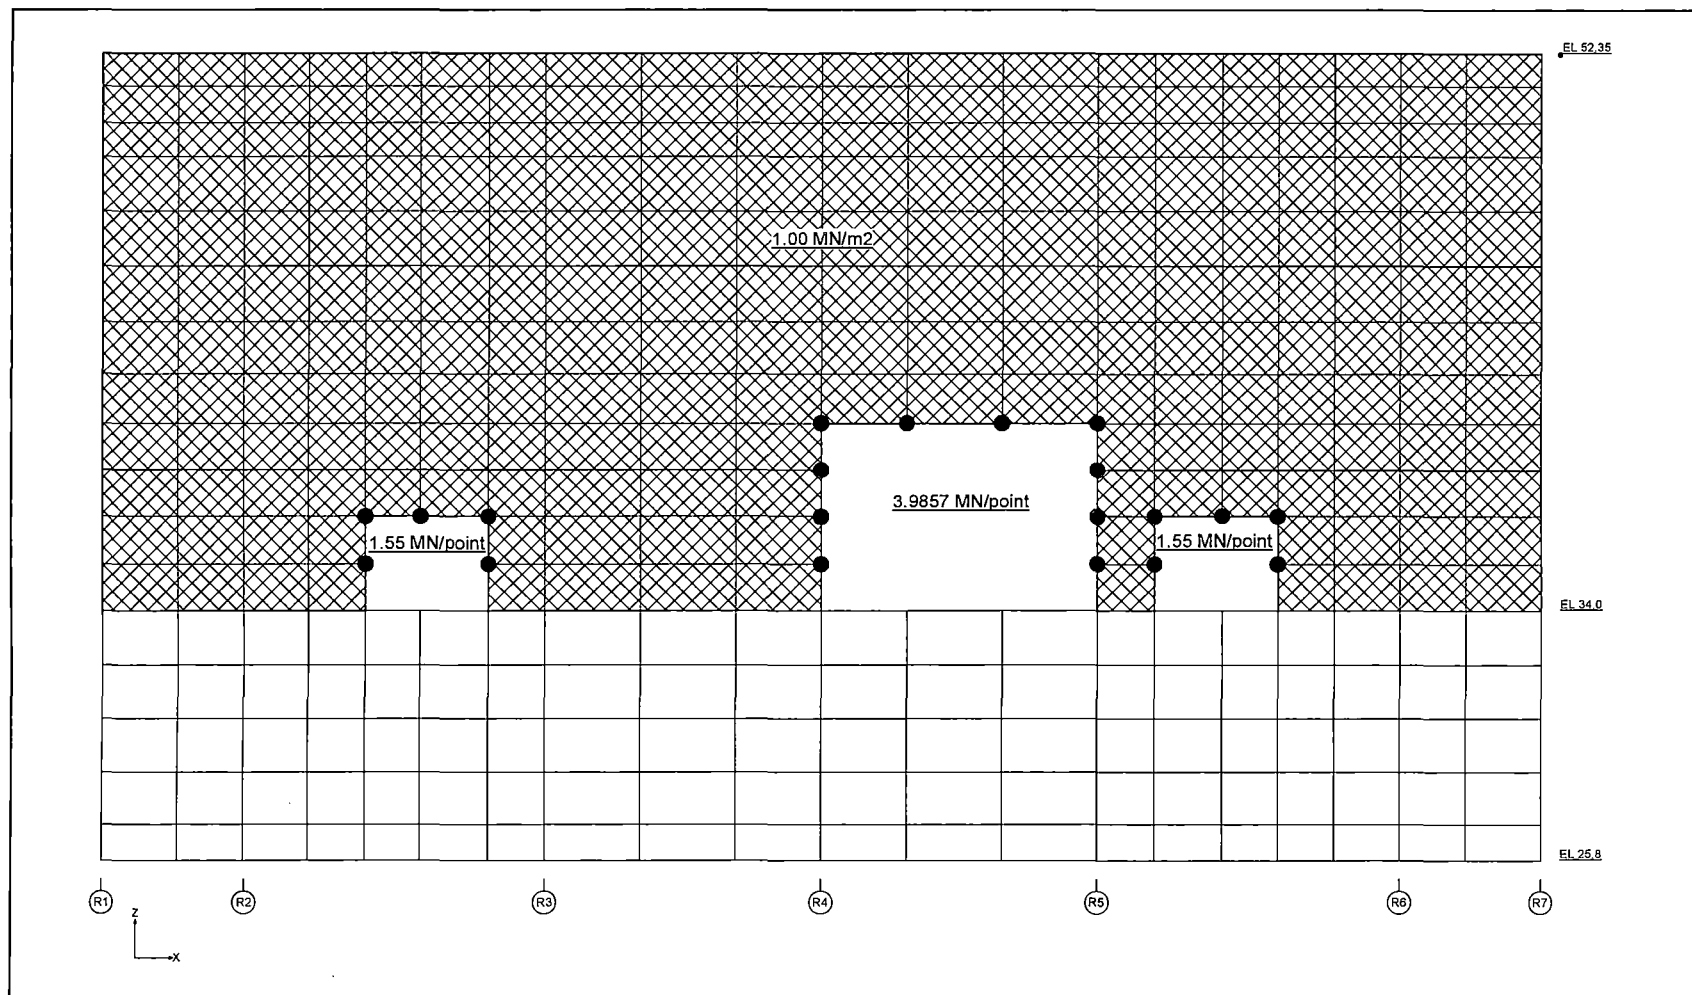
HELB Pressure Load (for RB General Rooms: RF Wall)
